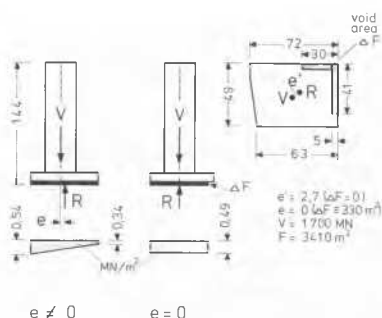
Centering of the foundation by means of a void beneath the foundation slab
